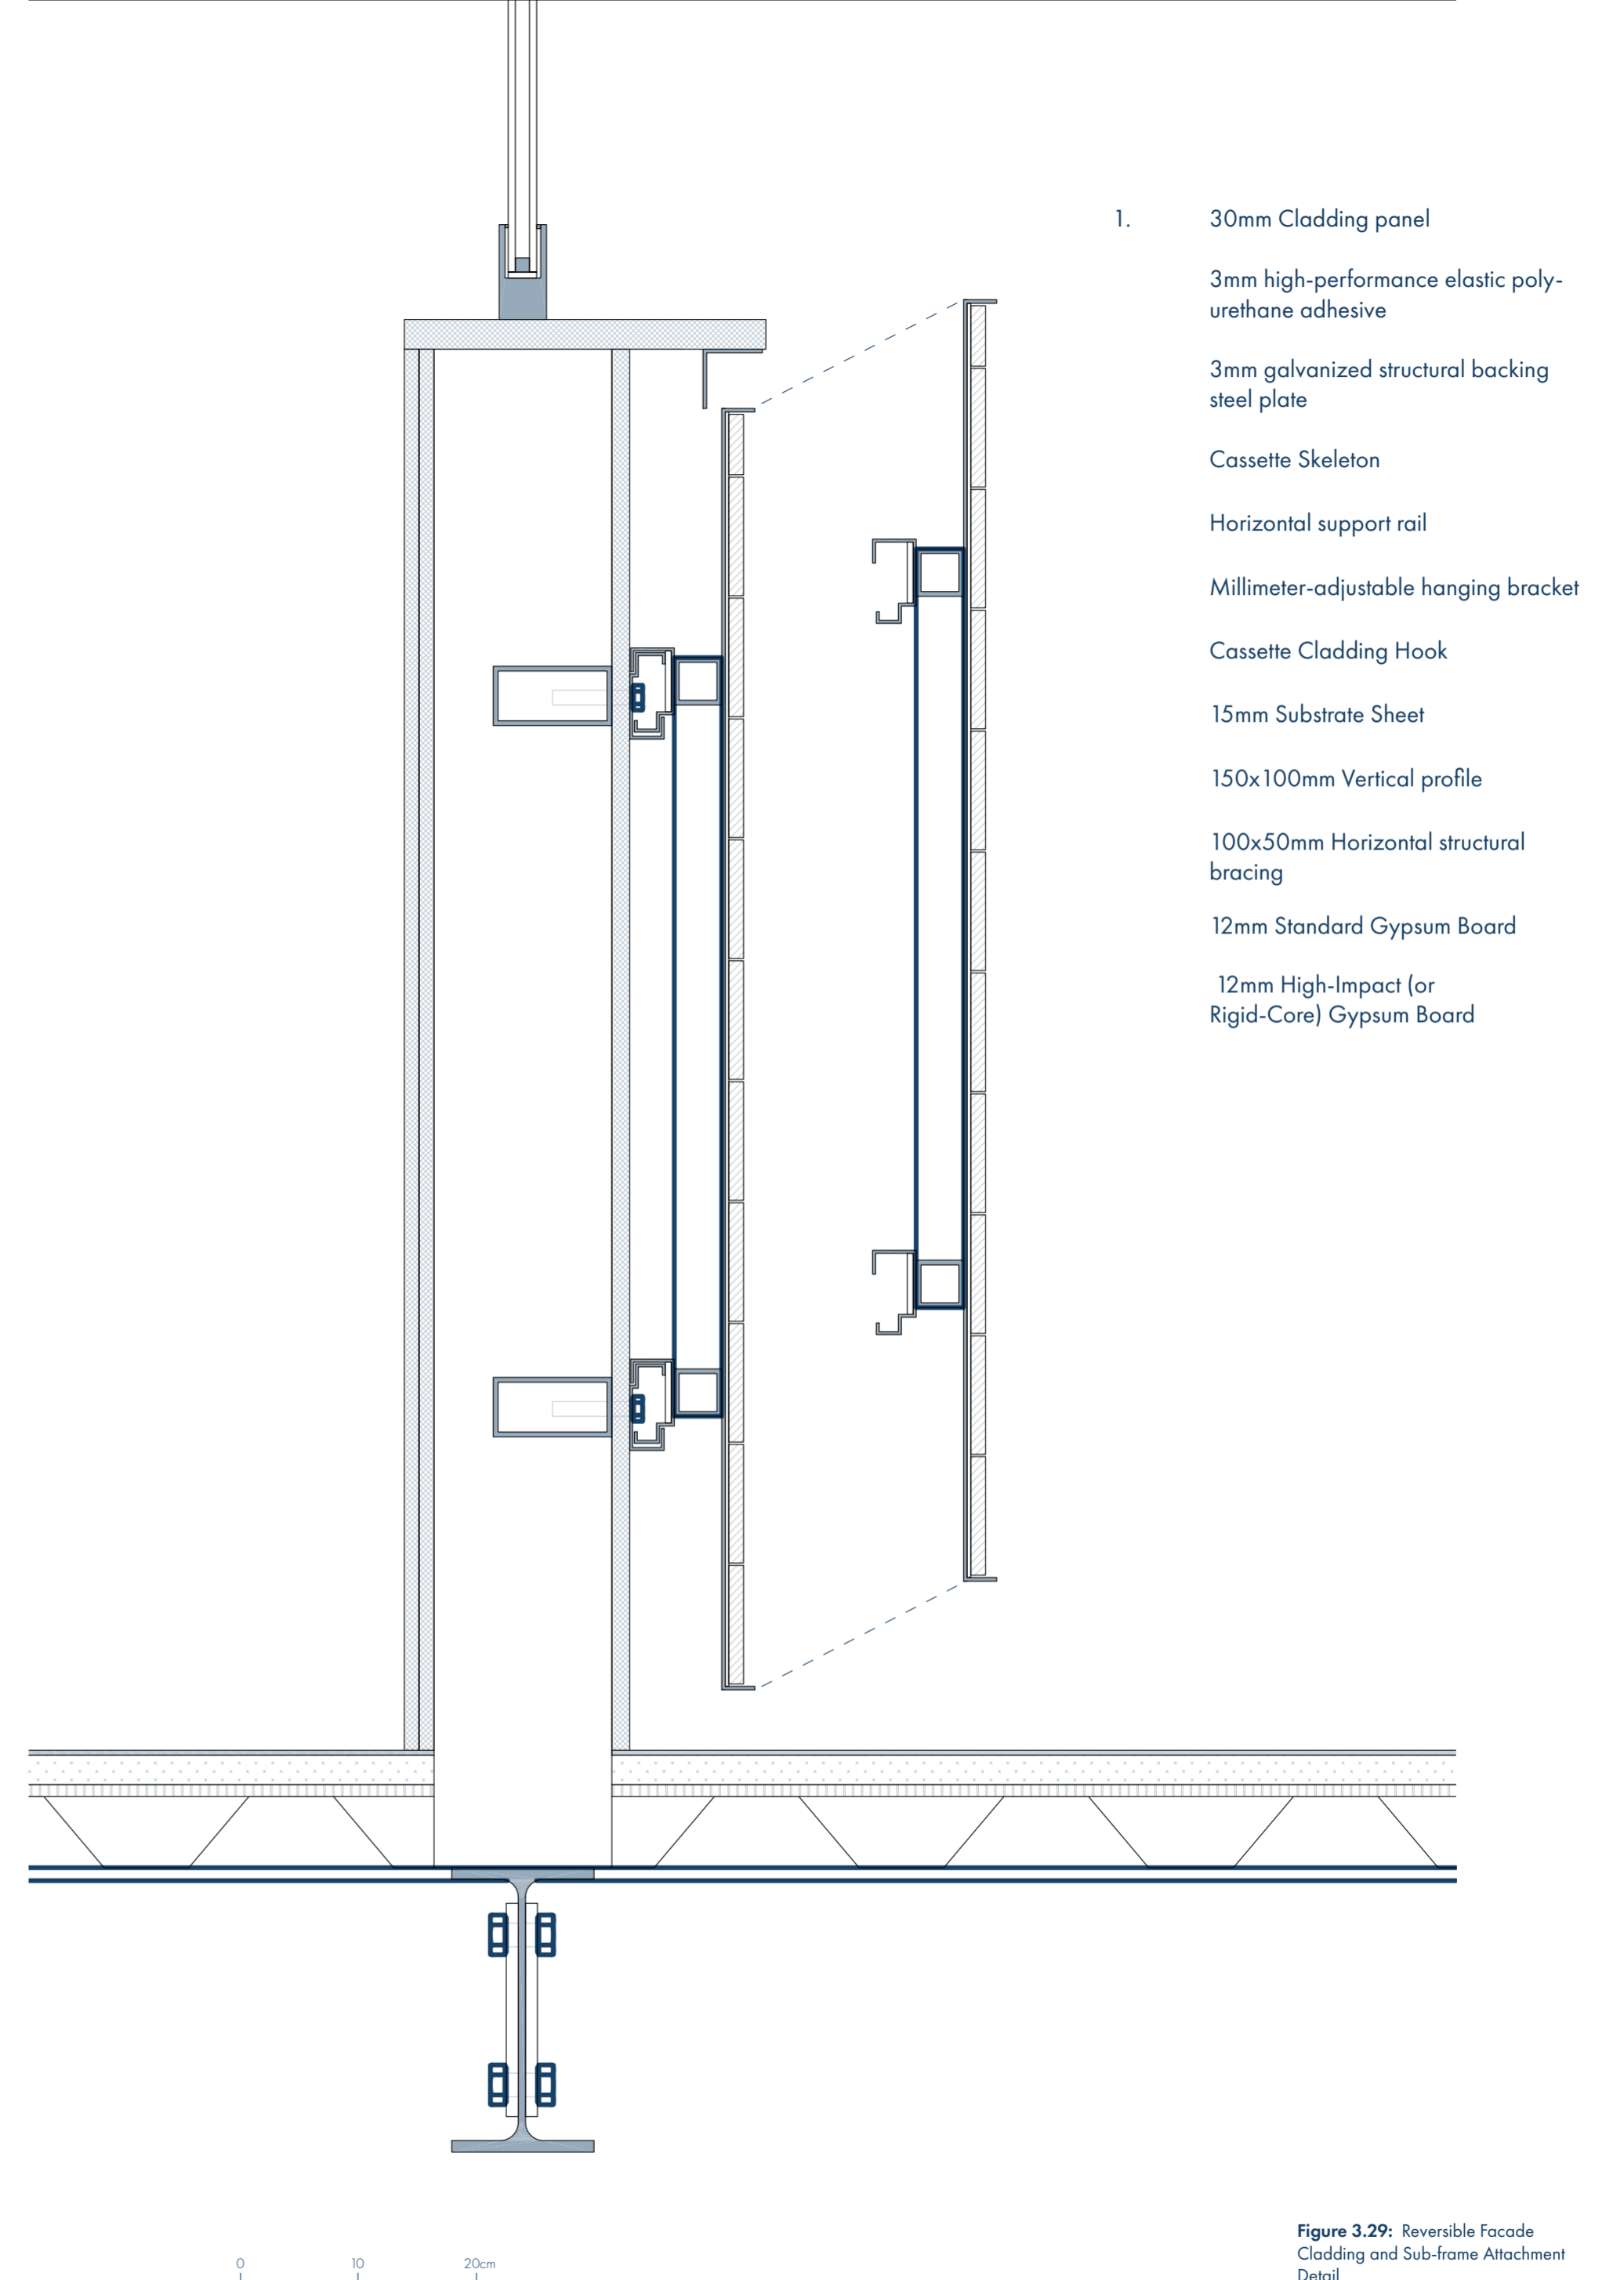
Reversible Facade Cladding and Sub-frame Attachment Detail
